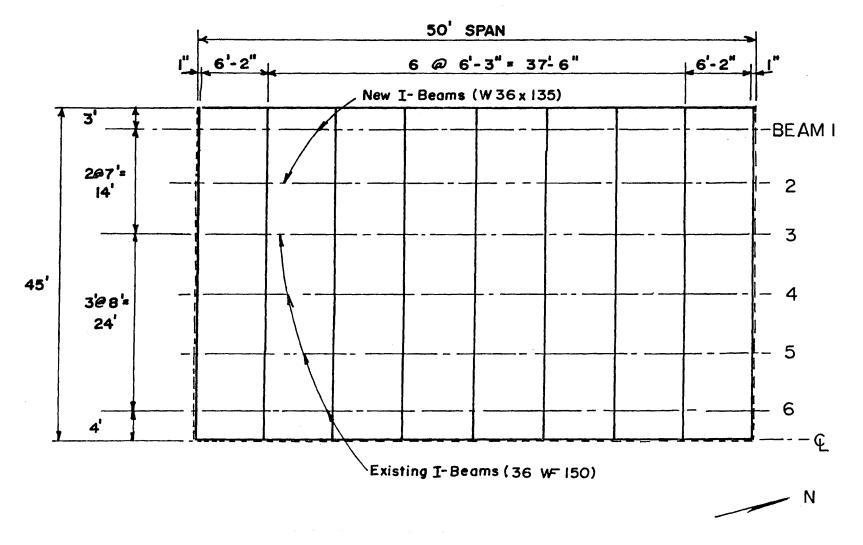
Plan View of Precast Decked Span of SPUR 326 Bridge.
